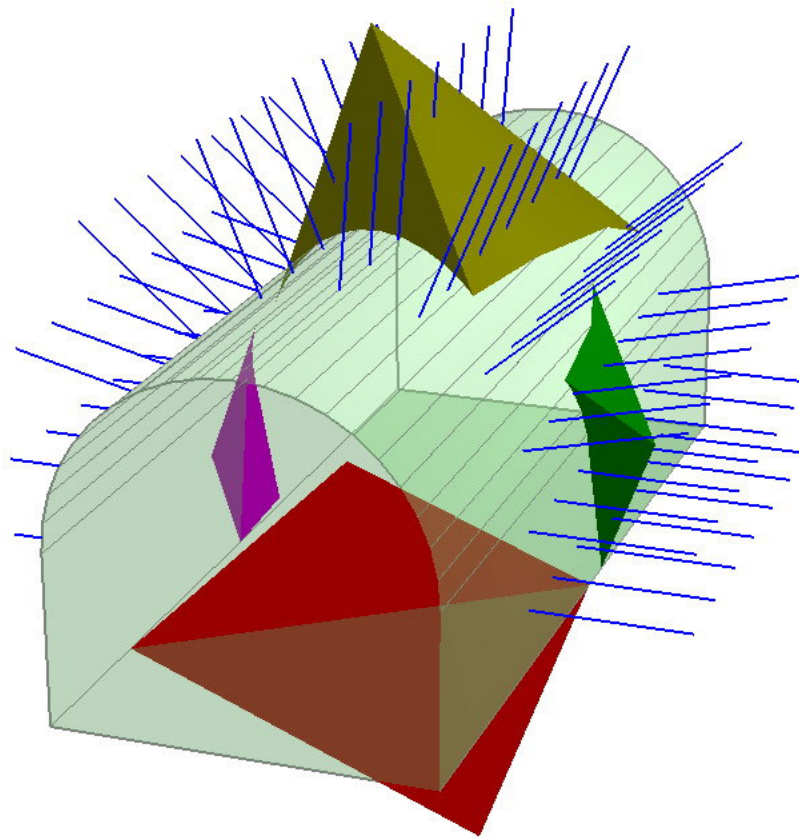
Rock bolting pattern to stabilize the roof and sidewall wedges in the tunnel example discussed earlier.
